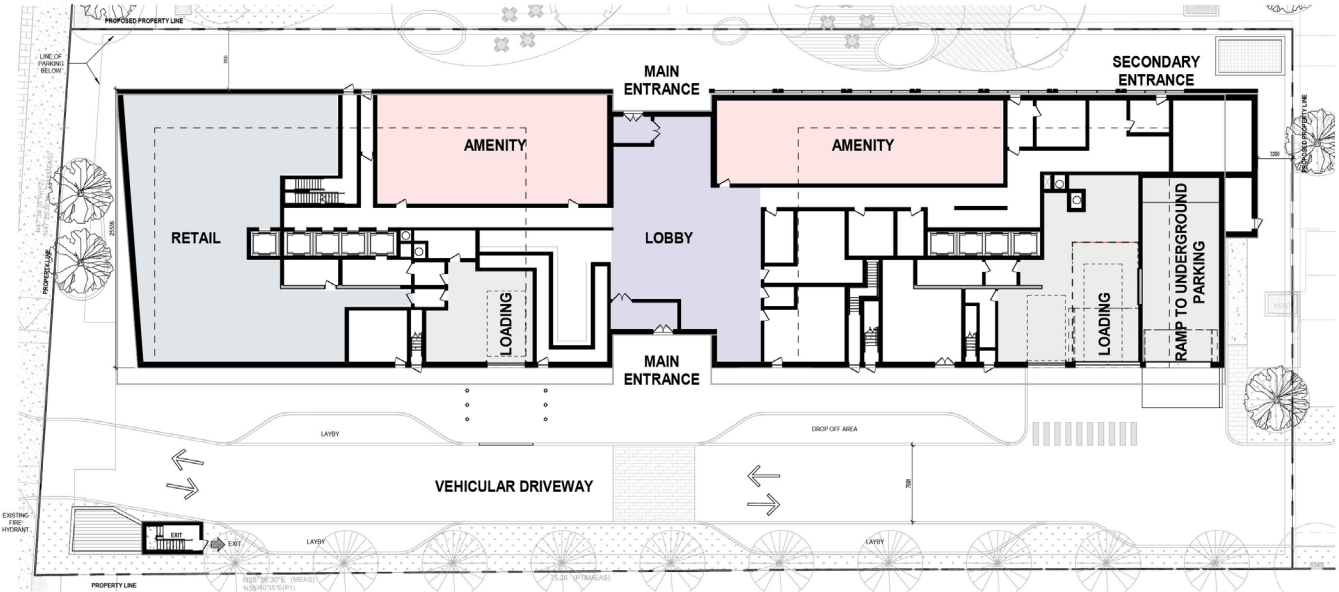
Ground floor plan (Source: BDP Quadrangle)
